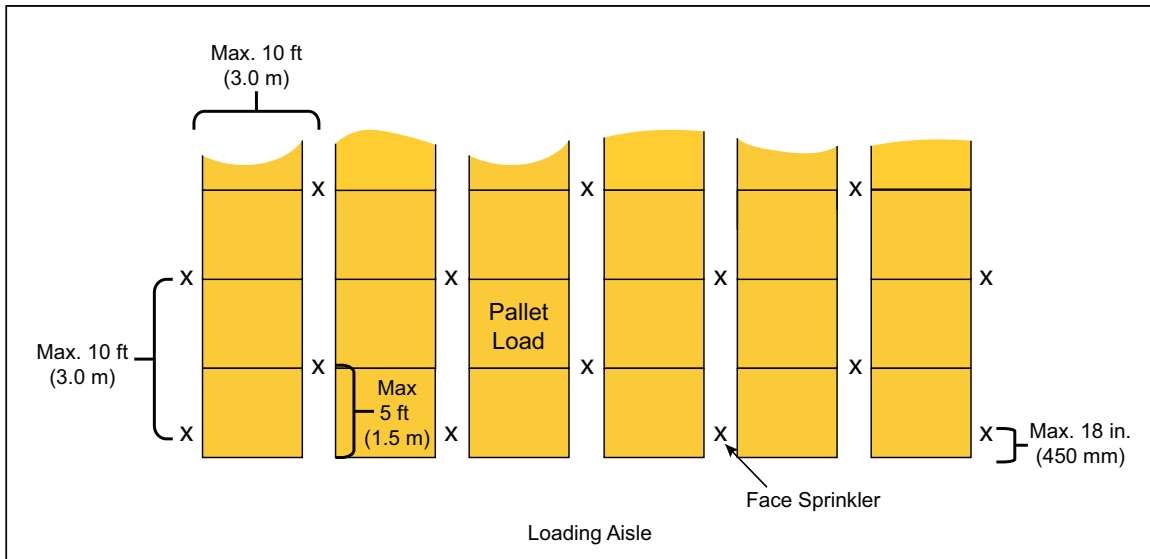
Plan view of horizontal in-rack sprinkler arrangement for multiple-row racks. *Note: consider this in-rack sprinkler arrangement as IRAS(EO) when using Table 13
